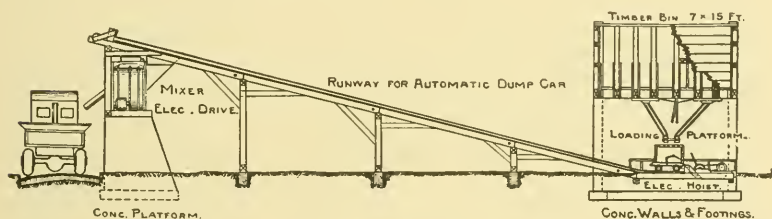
A central mixing plant using a three-bag mixer and having a bin storage for one hour's operation.
